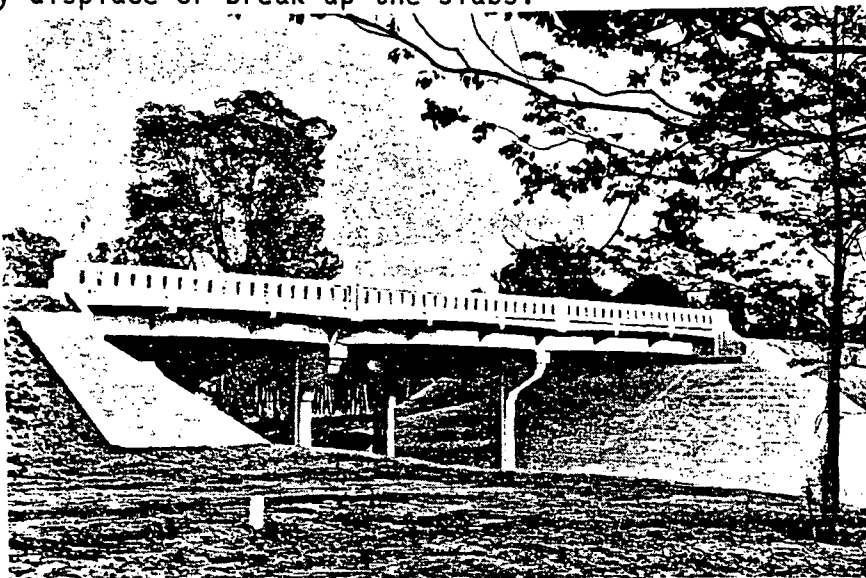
Precast Concrete Panels Protect Slope From Erosion (Reference No. 4).
